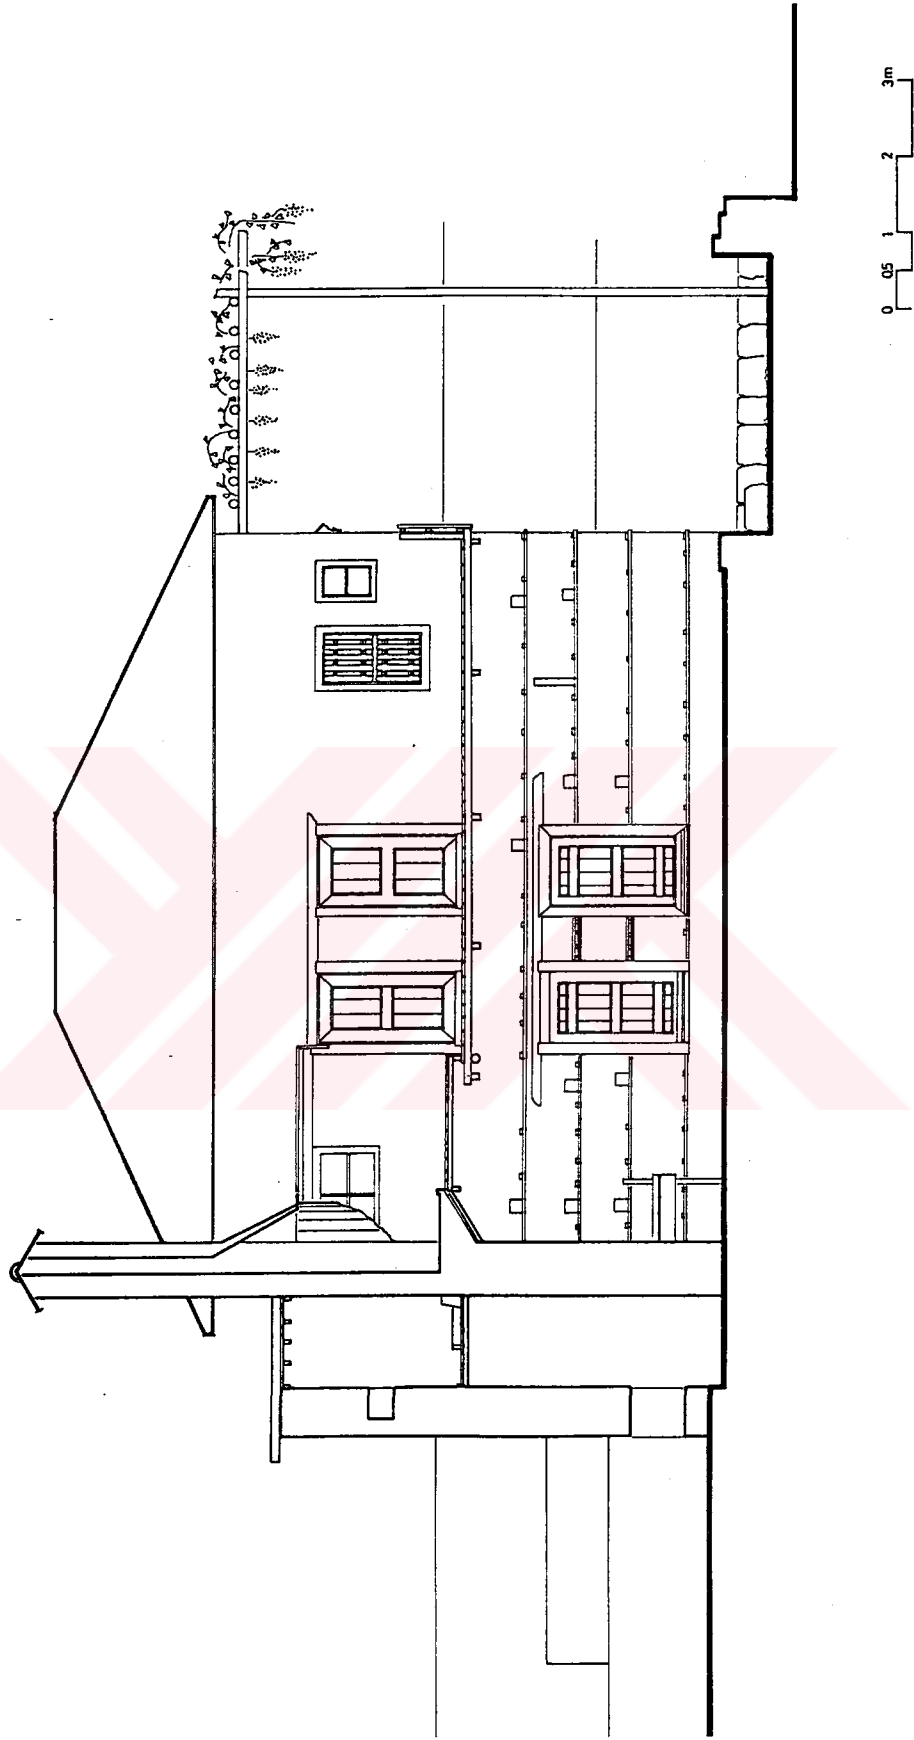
Section 1-1 of Hacı Hüseyinler House
